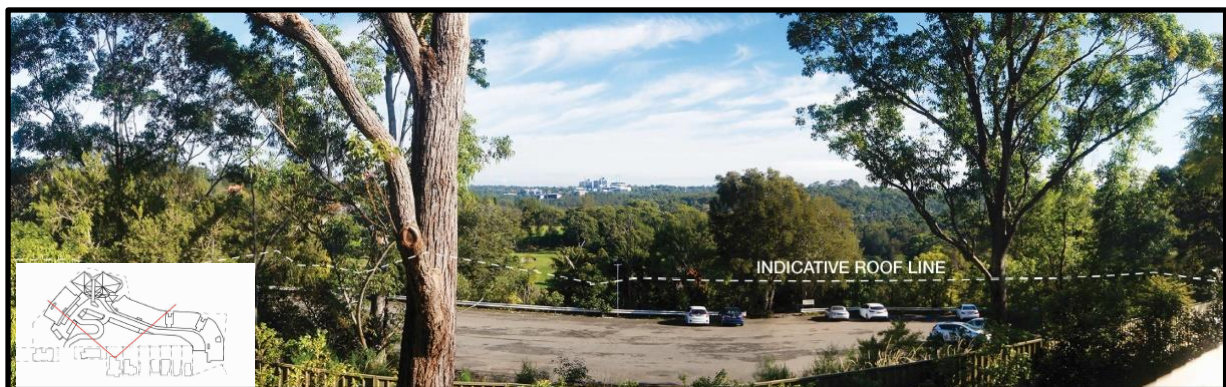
Visual impact assessment illustrating existing view from living room balcony to 29 Colwell Crescent. Source – Marchese Partners
